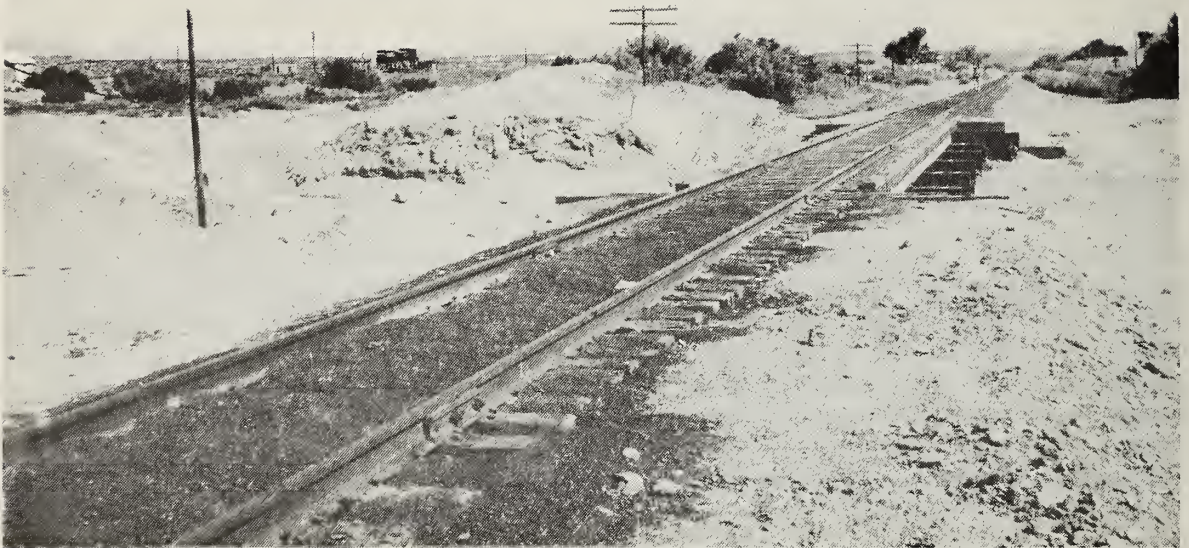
DAMAGE TO SANTA FE RAILROAD RIGHT-OF-WAY FROM WALNUT CREEK DRAINAGE. TRACK AND BRIDGE WERE RAISED 18 INCHES TO ALLOW MORE CLEARANCE UNDER THE TRESTLE
